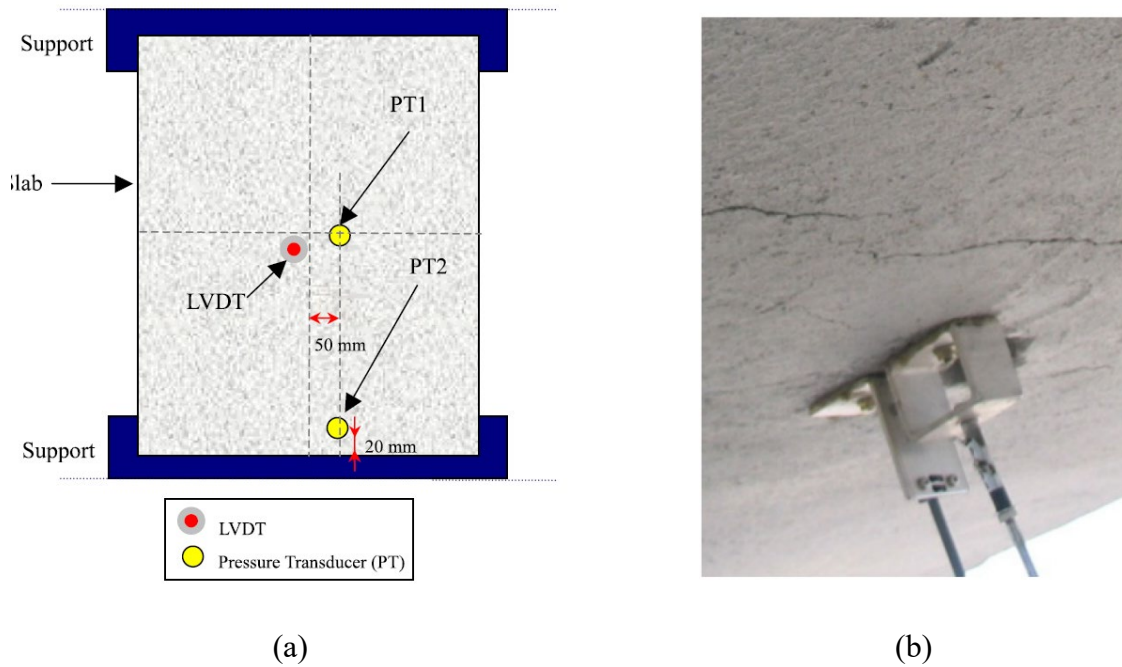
Blast testing: (a) Slab instrumentation and (b) LVDT connection to the underside of a test specimen (88).
